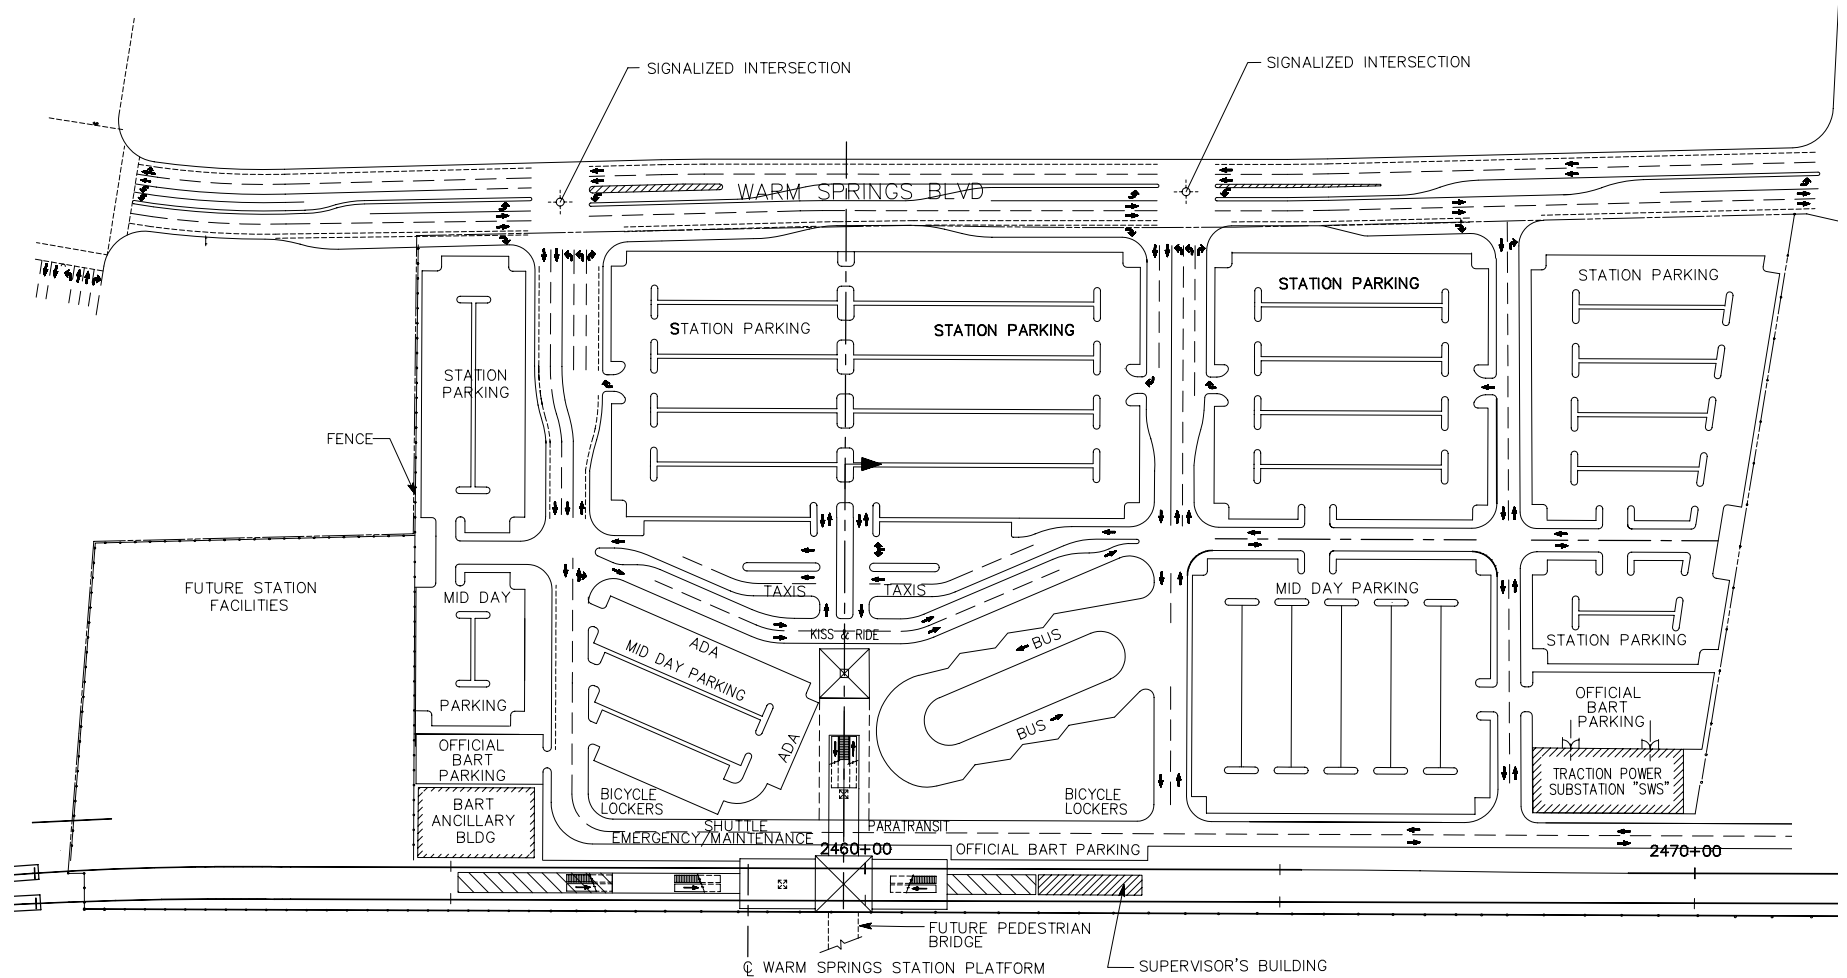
Proposed Site Plan Of Warm Springs BART Station
